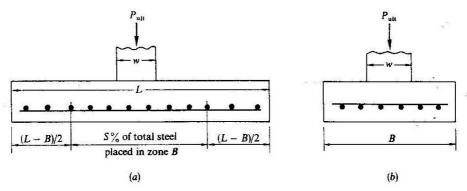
Rectangular-footing steel requirements for short side (ACI, art. 15.4.4). (a) Place half of remaining steel in each zone; if inadequate for shrinkage, use the amount to satisfy shrinkage requirements. (b) Note longitudinal steel on bottom for greater efficiency.
